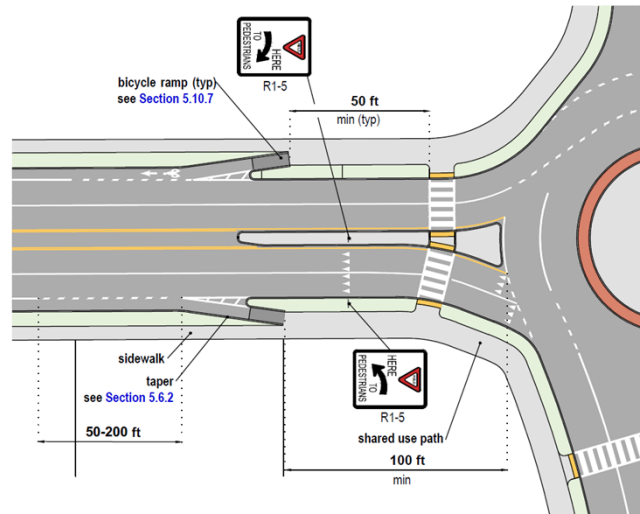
Typical Layout of Bike Lane Transitions to Shared Use Path at Multilane Roundabout with Bike Ramps
